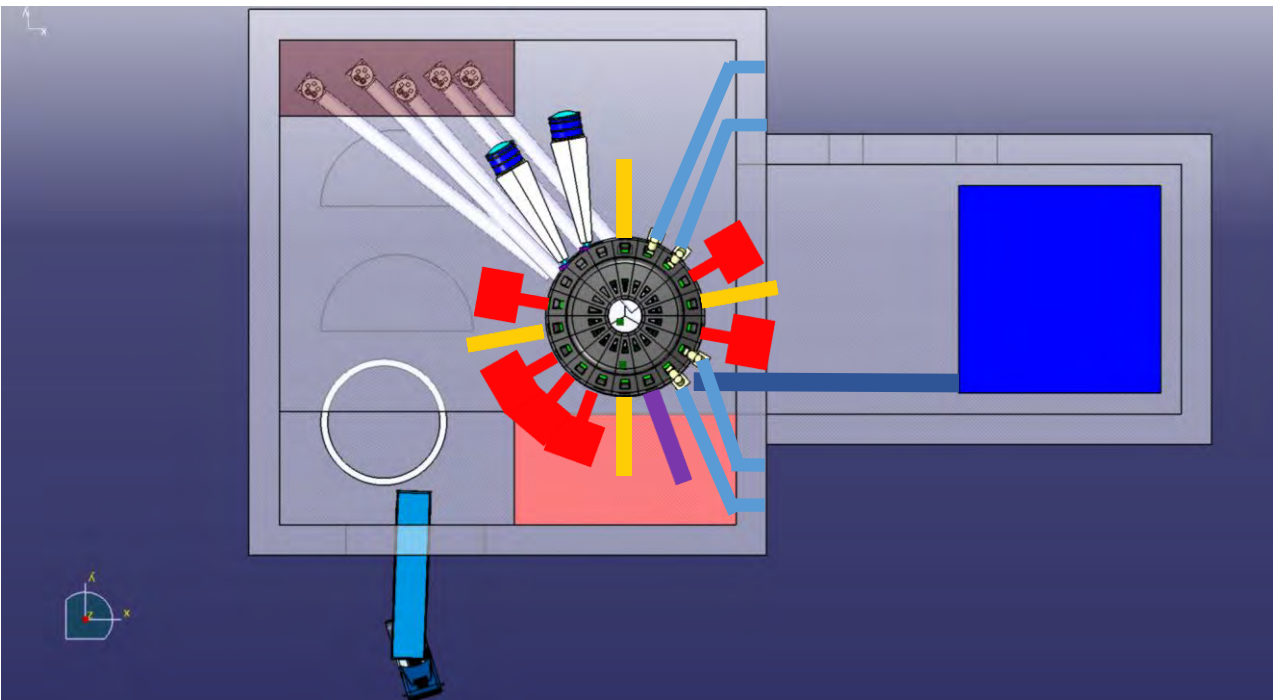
Top view of the DTT torus hall at the end of assembly.
